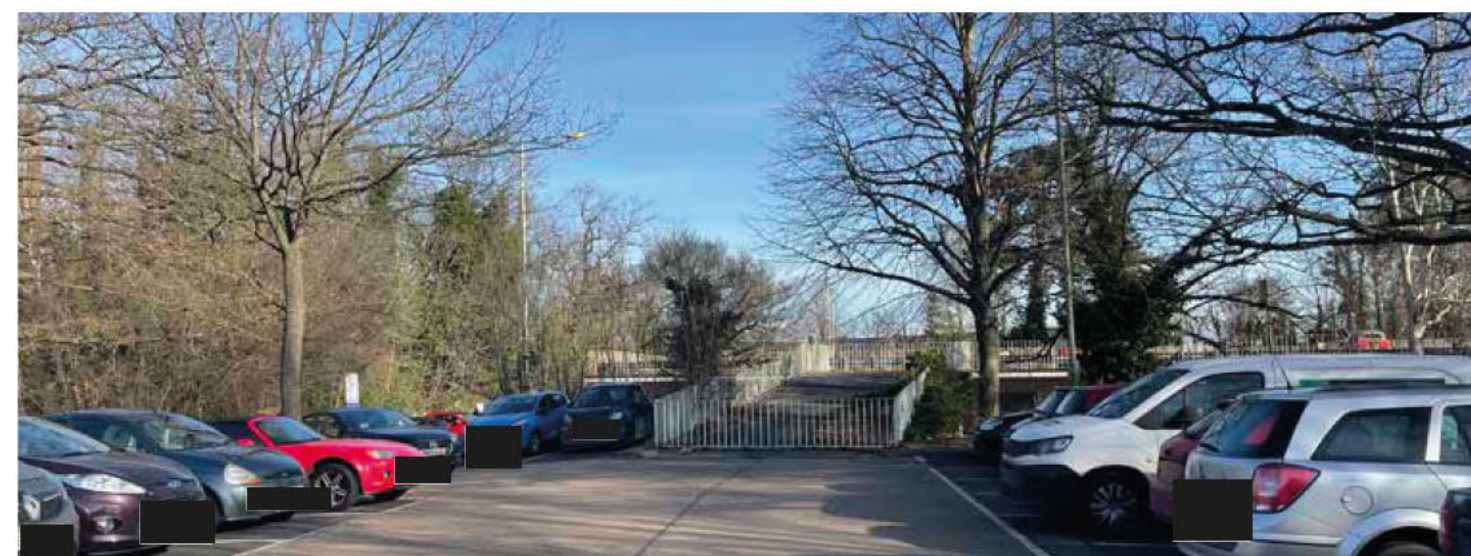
The site - hardstanding and entrance to first level car parking, looking east from the west of the site.
